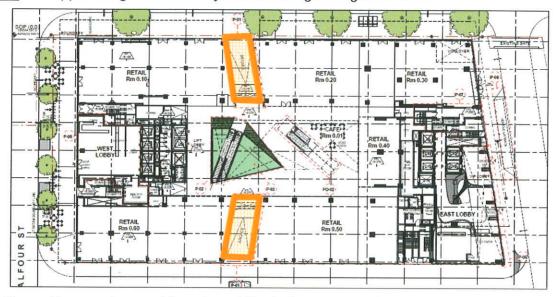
Proposed ground floor layout illustrating proposed angled site link
